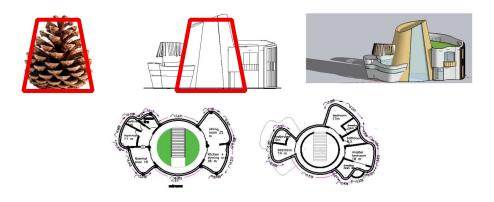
the second type of bungalows (3d view, plans, and façade)
